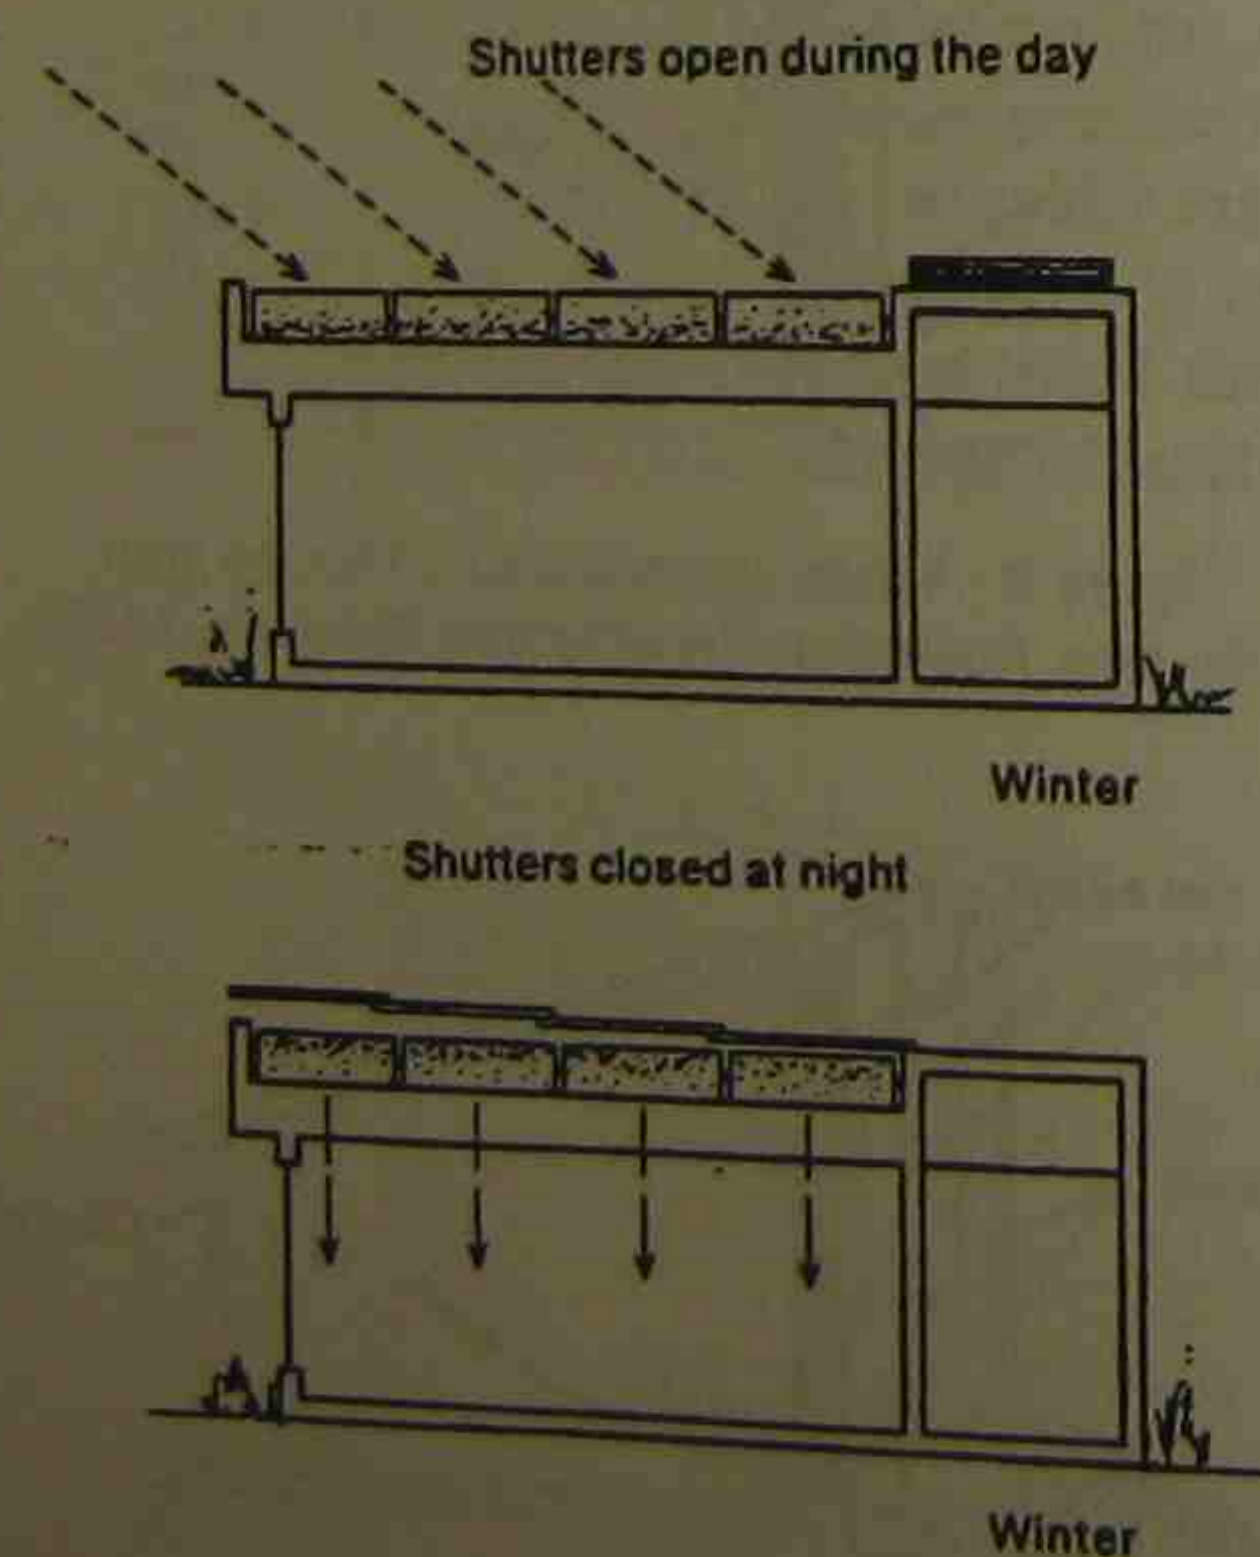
Operation of a water roof for heating. (Source: Australian Construction Services, 1983).
